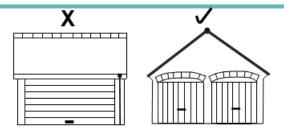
Double garages should be accessed by two separate doors divided by a pier if in a conservation area or within the setting/surroundings of a listed building.
